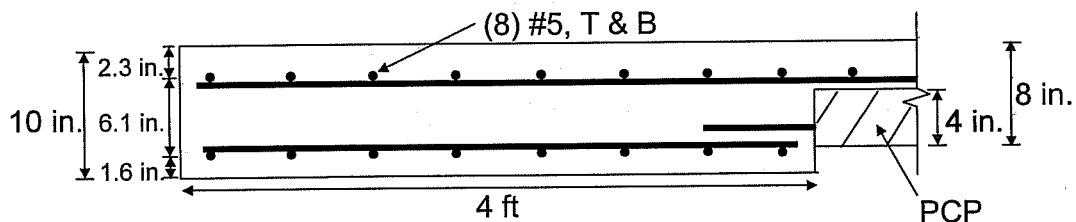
Cross-section of IBTS detail (Ryan 2003)
